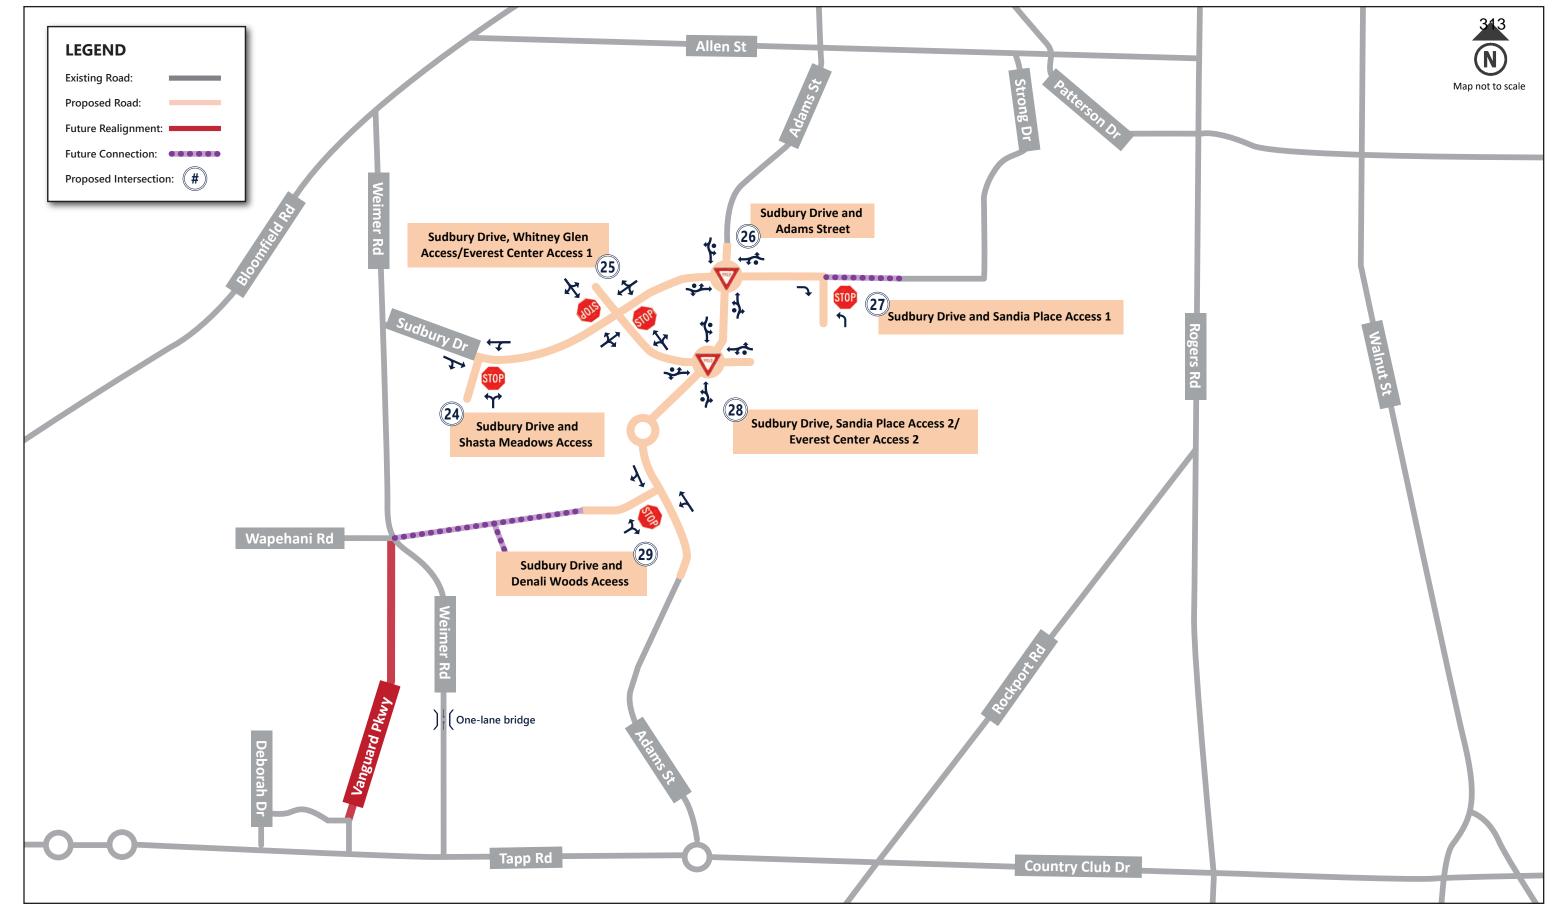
Proposed Intersection & Future Weimer Road Re-alignment
